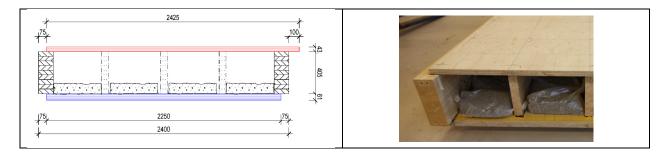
Floor element cross section (left) [1] and gravel bags positioned inside the element cavity (right).
